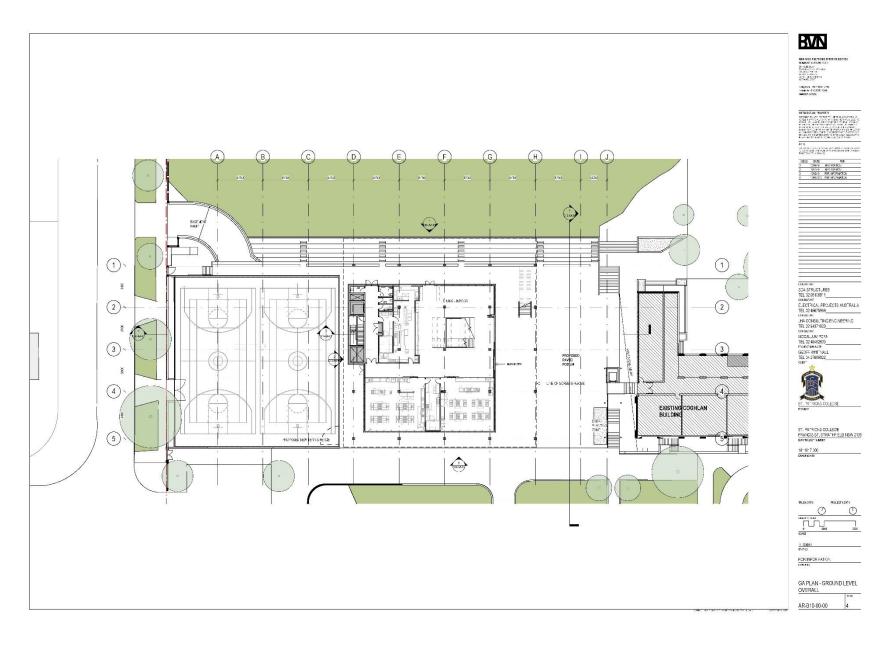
Proposed STEMM building – General Arrangement Plan – Ground Level. Source: BVN 12/2/2020, AR-B10-00-00 Issue 4
